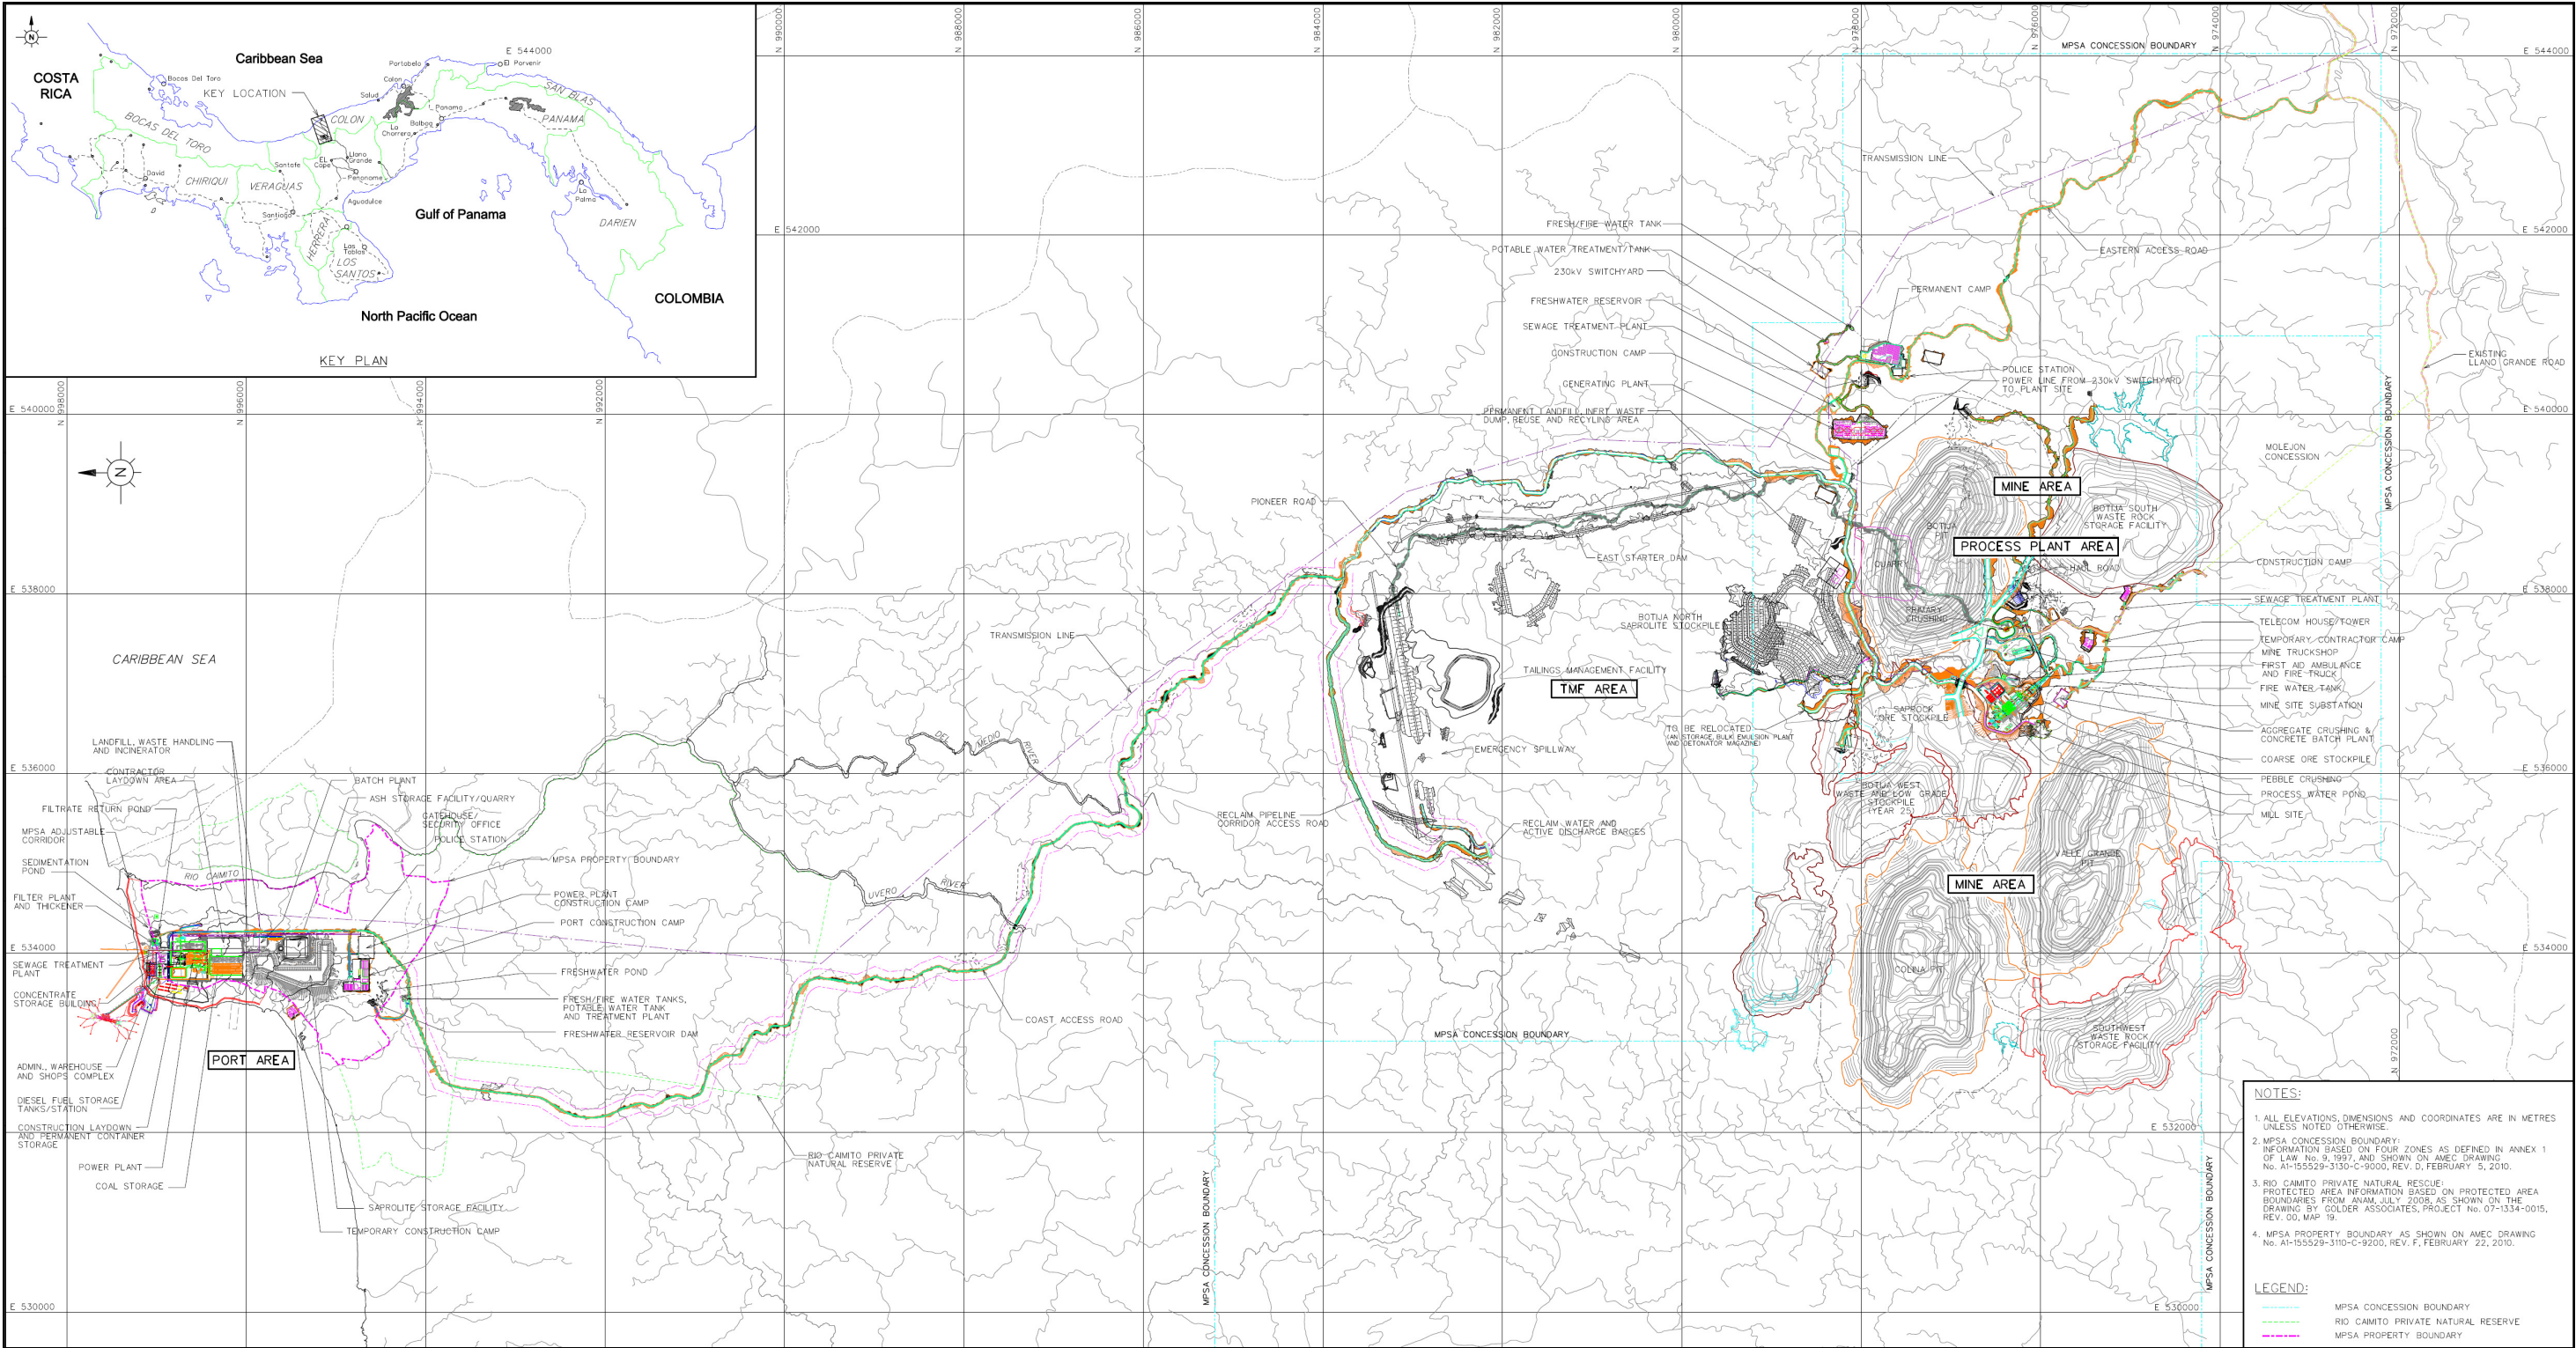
1: Overall Site Plan 504832-0000-41D1-0001
